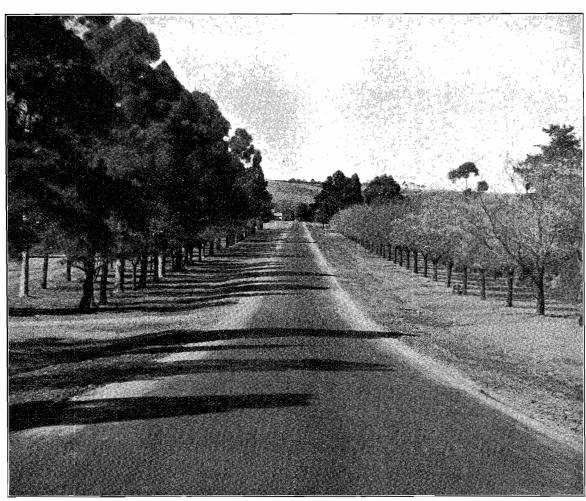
Reconstructed section of North-Western Highway at Keilor.
